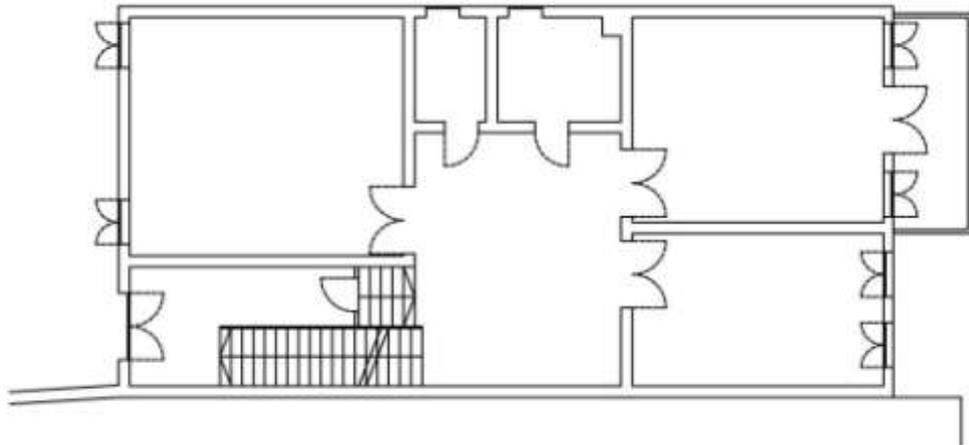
First floor plan of the house at 77 lot 30 parcel
